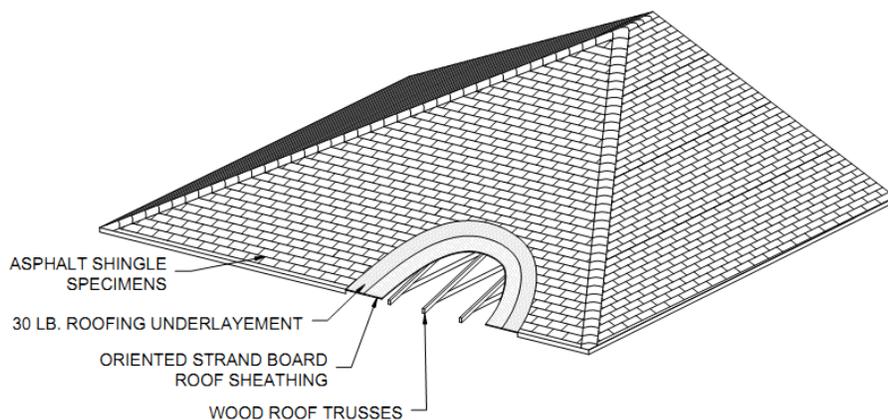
Test section construction detail (hip roof shown; gable-end roof also to be used)
